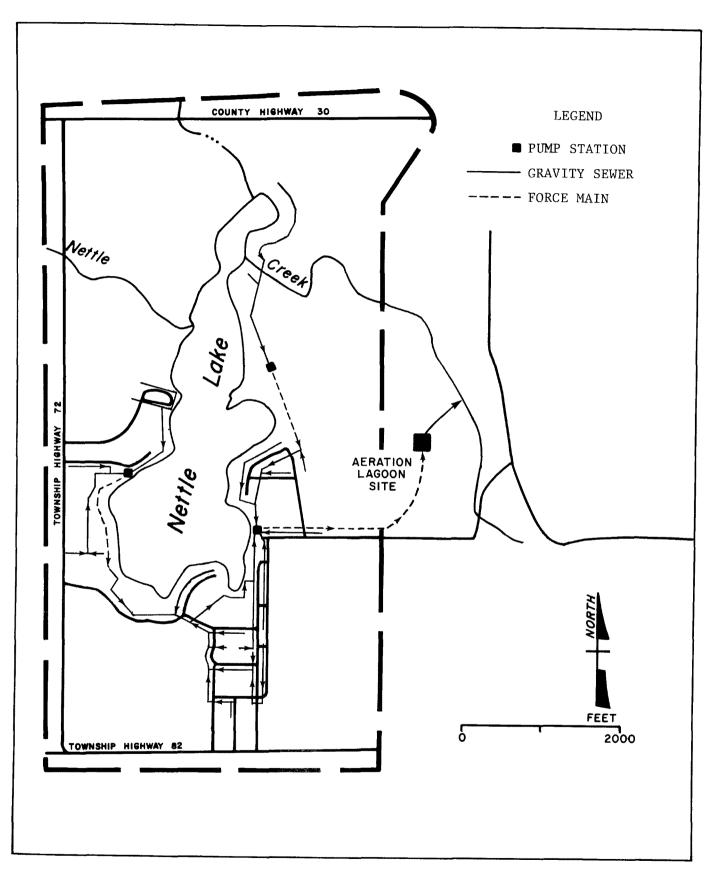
NETTLE LAKE: FACILITIES PLAN PROPOSED ACTION
